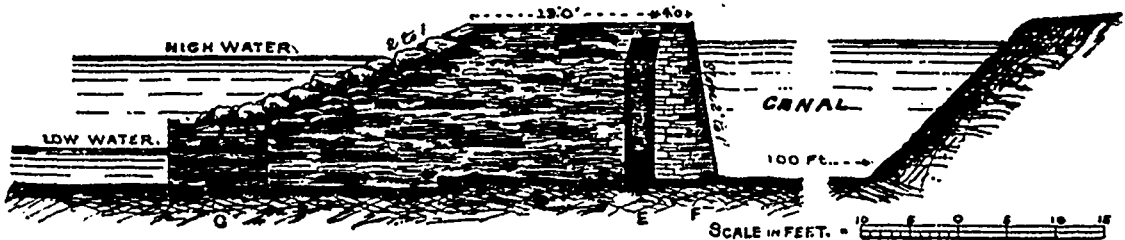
SECTION THROUGH CANAL EMBANKMENT.
